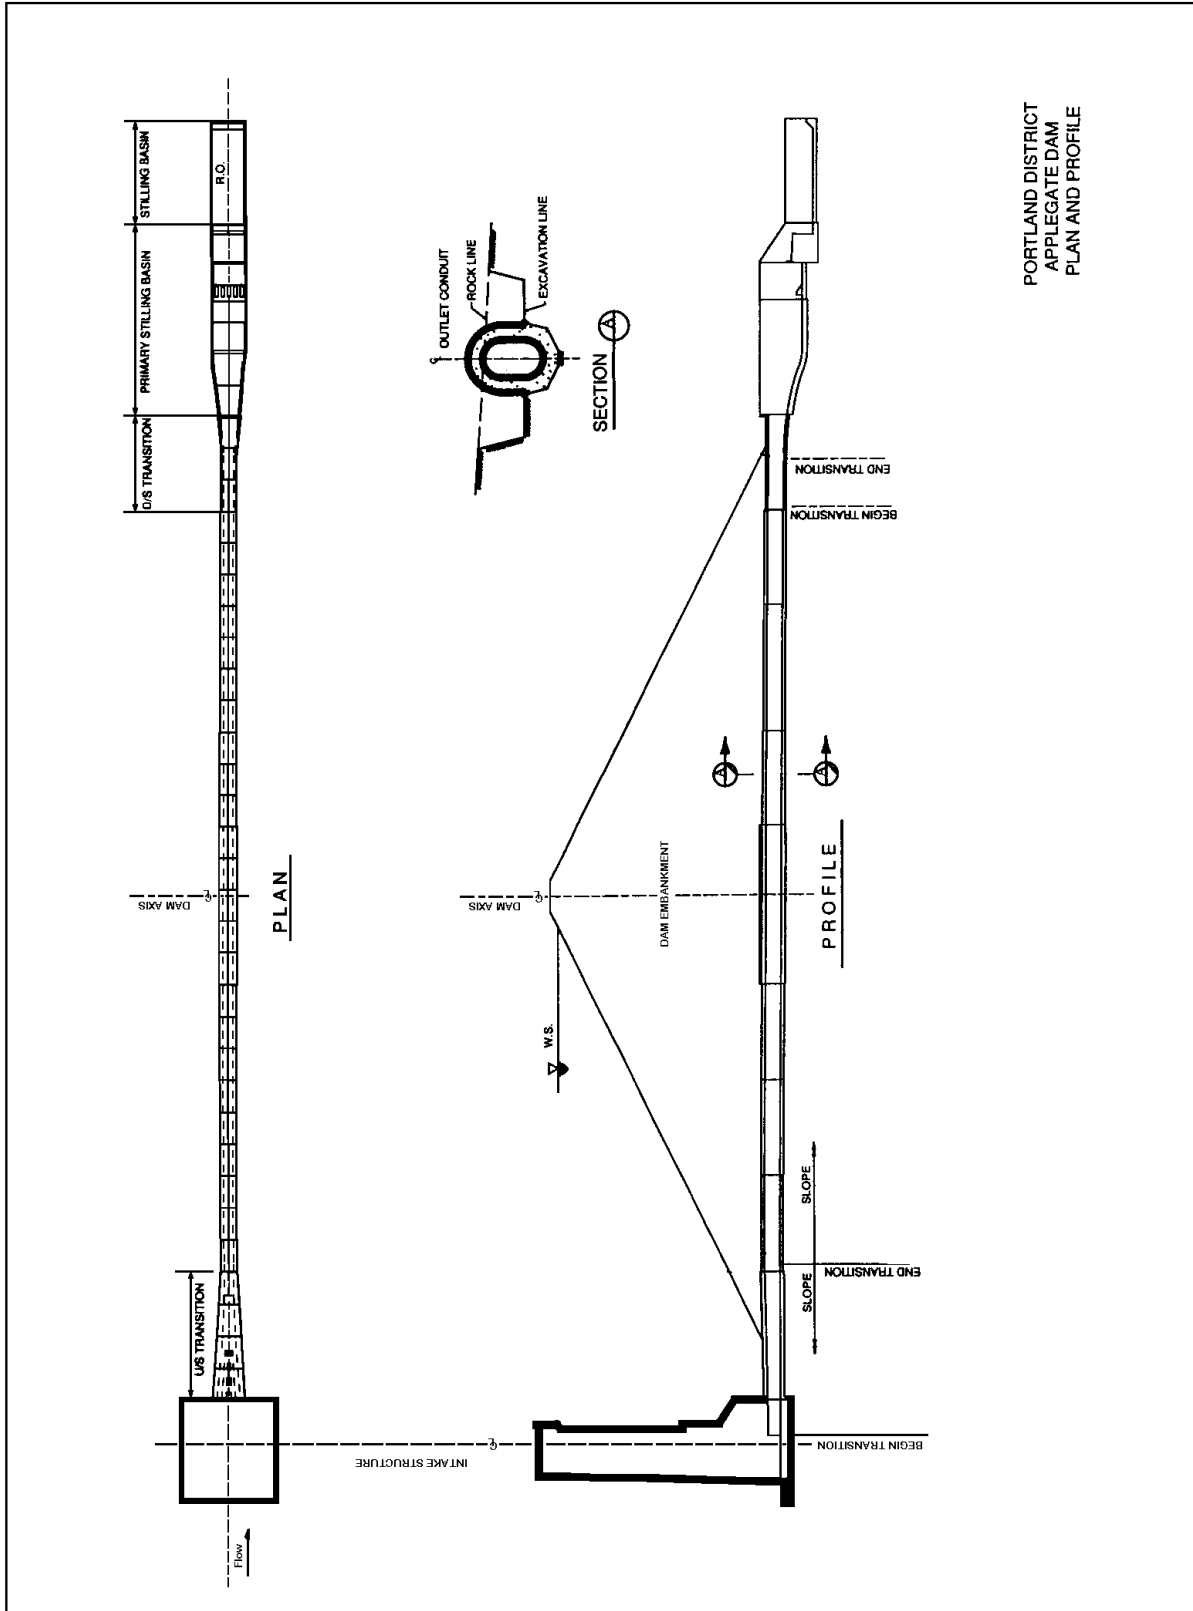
Outlet works under embankment dam, Applegate Lake, Oregon
